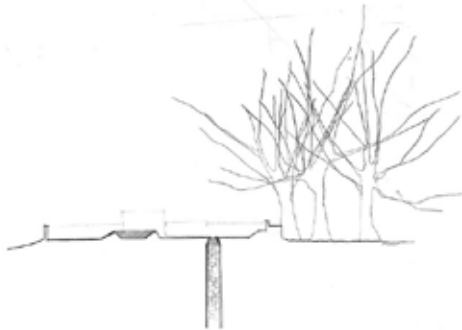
Upper Lawn Solar Pavilion Folly, redrawing of main section passing through the courtyard, highlighting the ground-scape. Drawing by the author, 2025.
